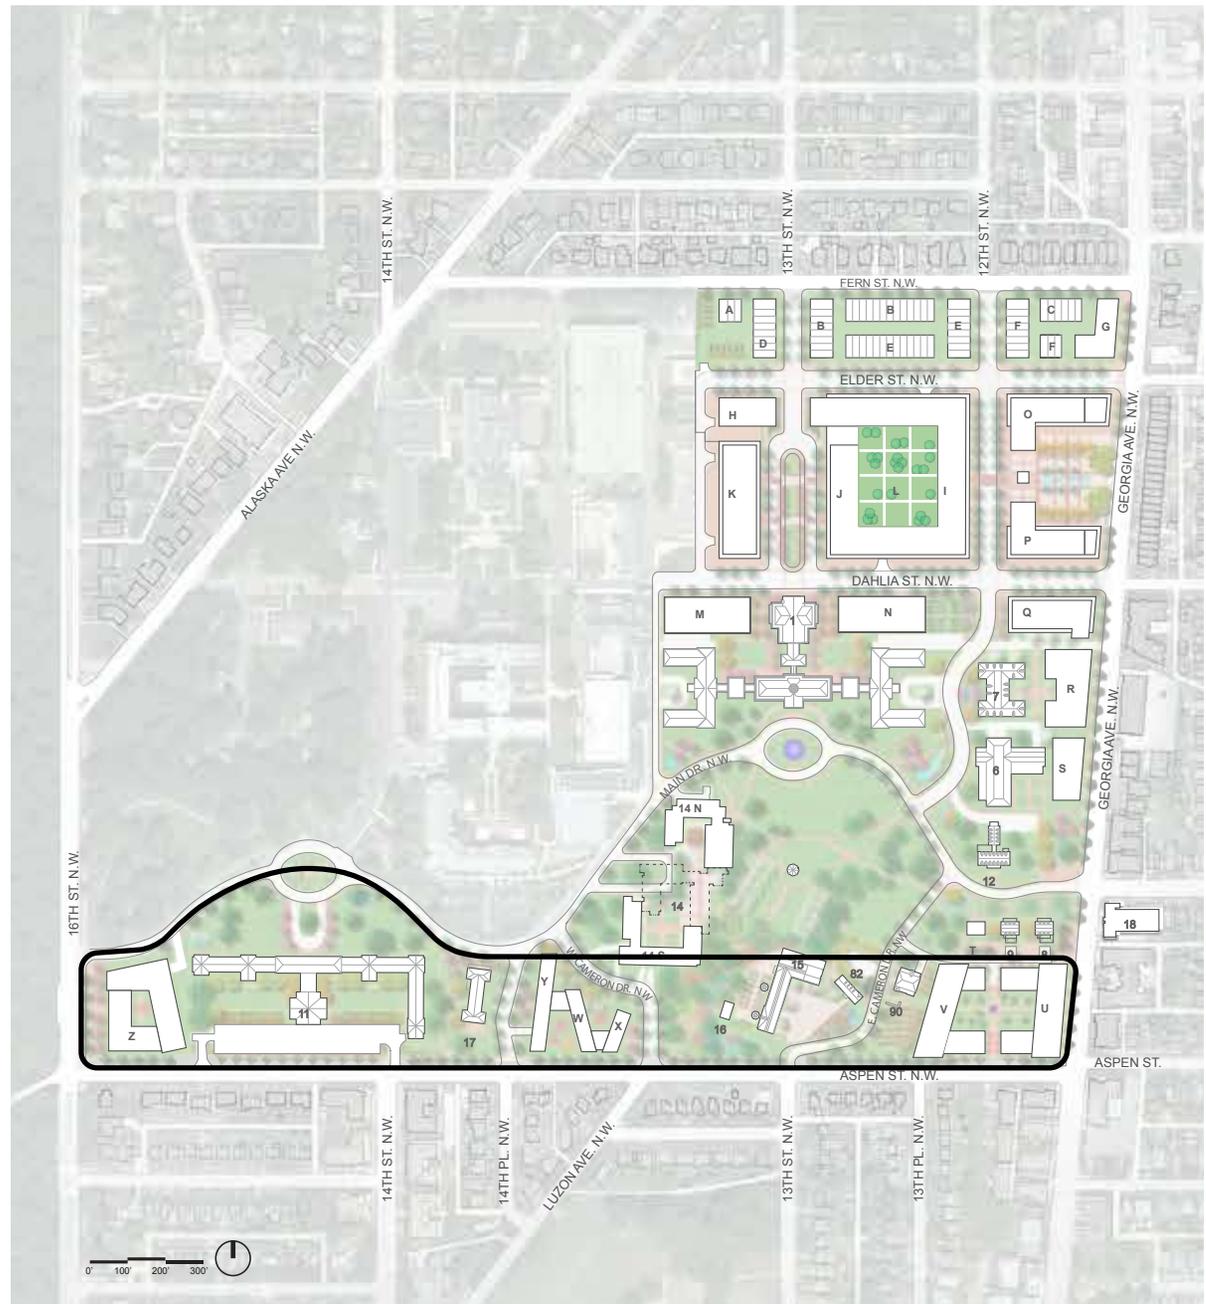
Sub-Area Key Plan - Aspen Street. Source: Perkins+Will.
